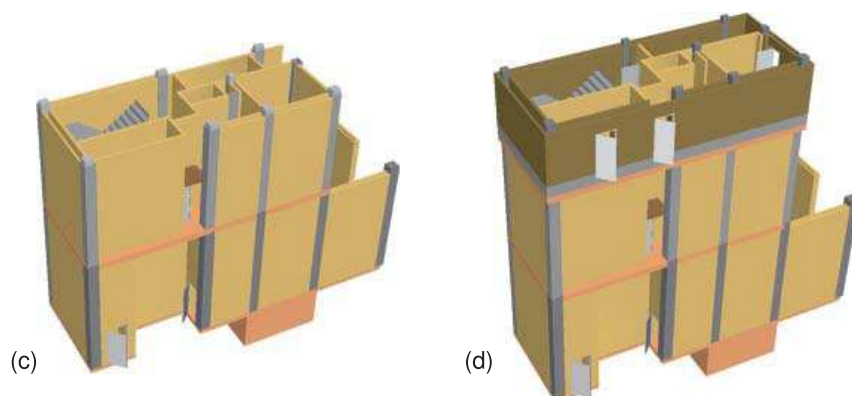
(c) Second floor as first – (d) and third floor – as separate reference files
